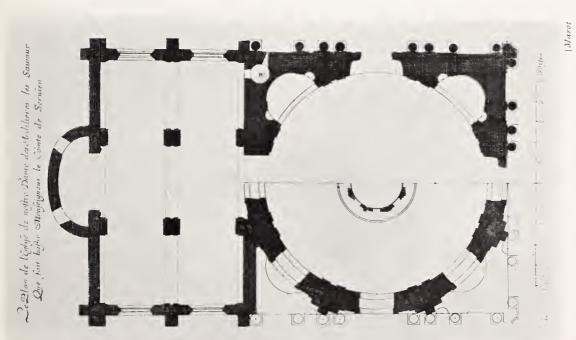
DETAILS: CHURCH OF LES ARDELIERS, SAUMUR
